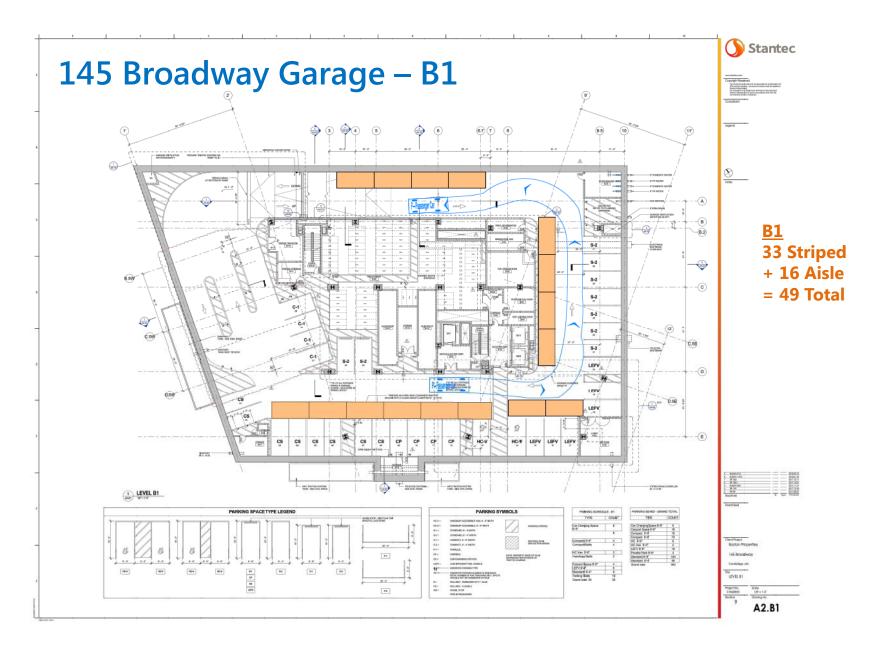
Proposed Layout 145 Broadway Garage (457 Spaces)
